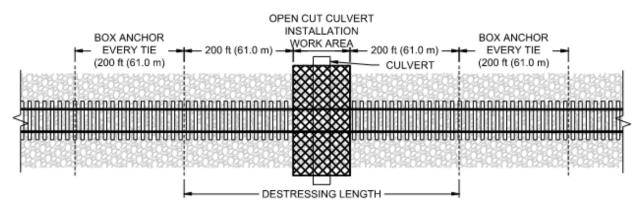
Destressing Length for Open-Cut Culvert Installations
